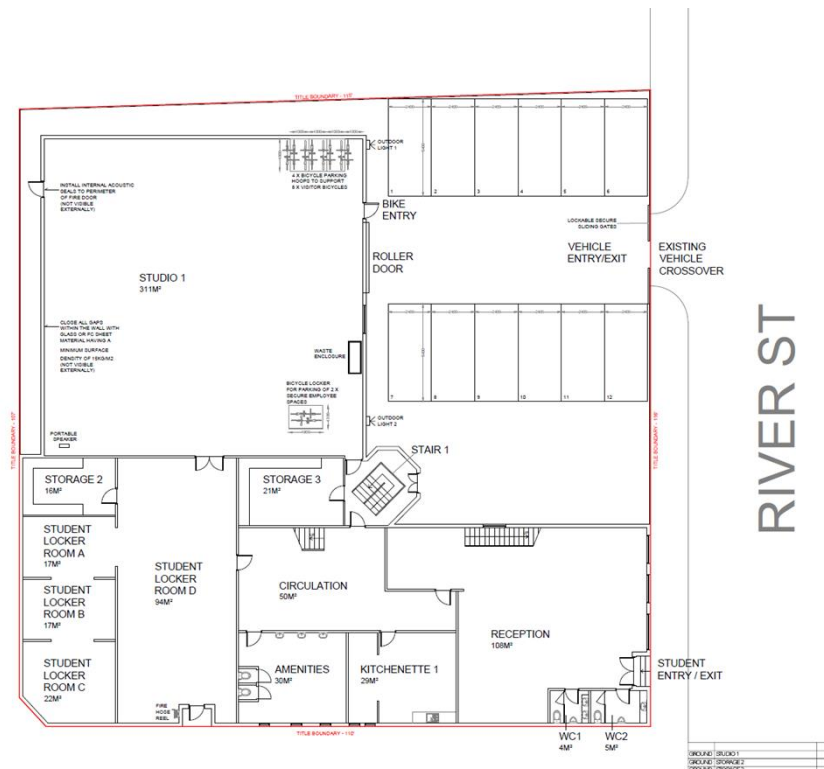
Proposed ground floor layout (Source: Decision Plans)
